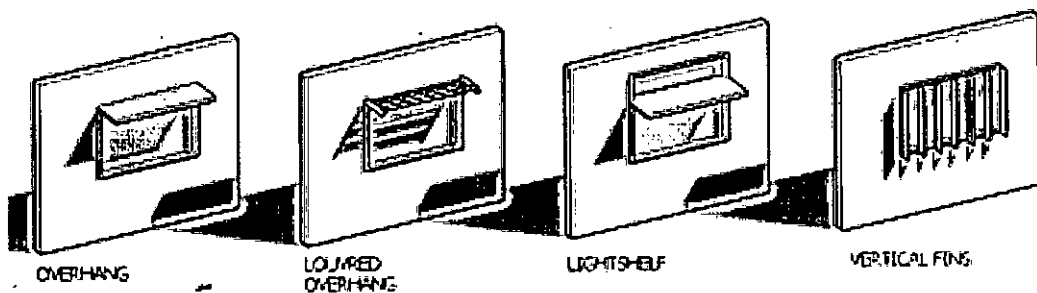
Common types of exterior shading (Source: Daylighting Guide for Building)
